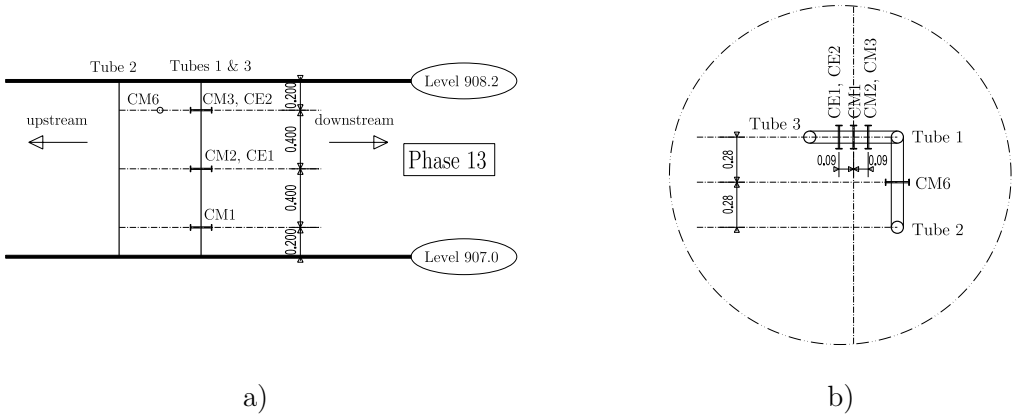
Detail of sensor location T13 to T23 (plan view) - (units: m)
